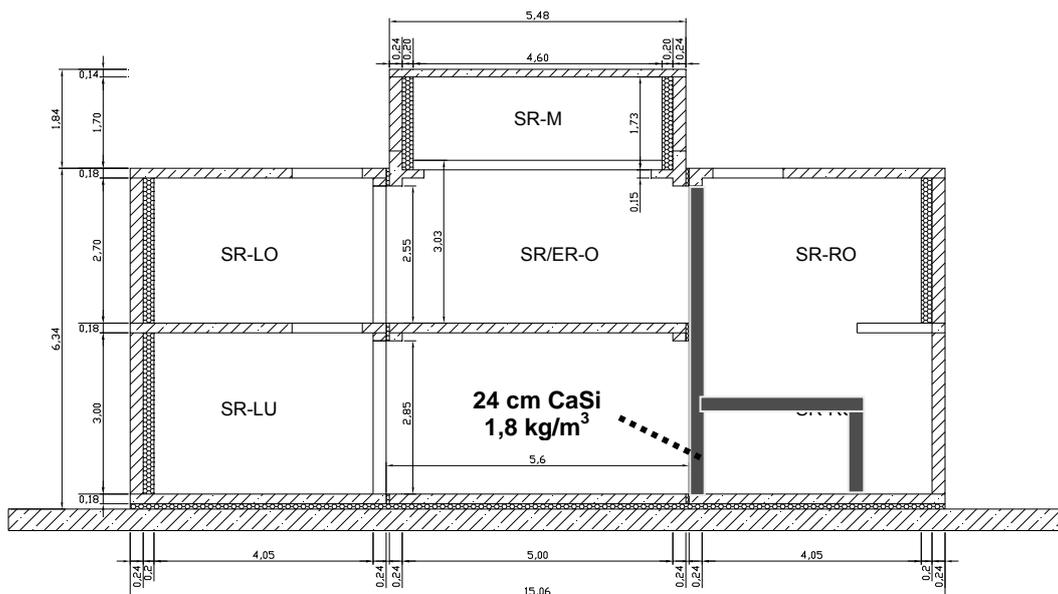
Staircase test facility; stair wall and stair landing indicated in grey
